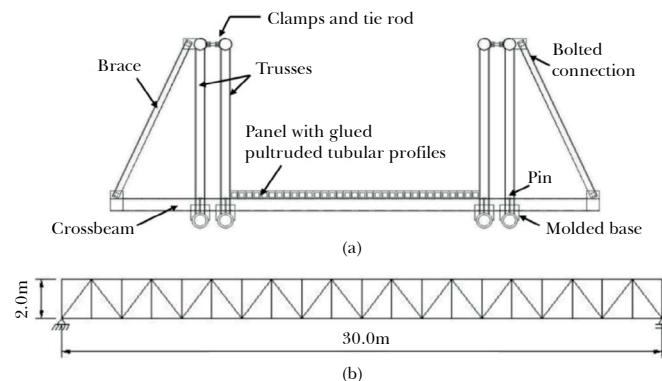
Dismountable Bridge: (a) cross-section, (b) structural scheme of the beams. Source: [1].
